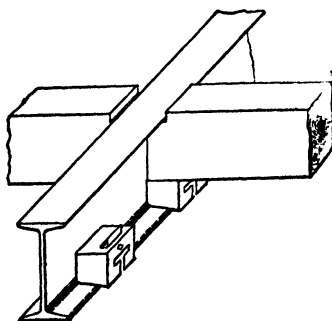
Wooden Beam Framed to I Beam with Duplex Box-hanger
